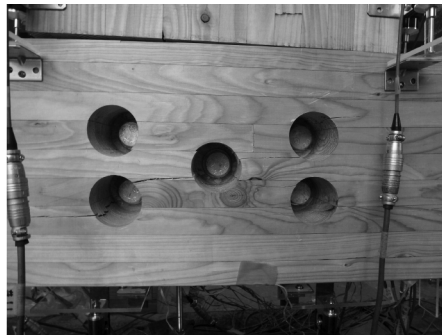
Shear cracks at pre-drilled hole periphery
